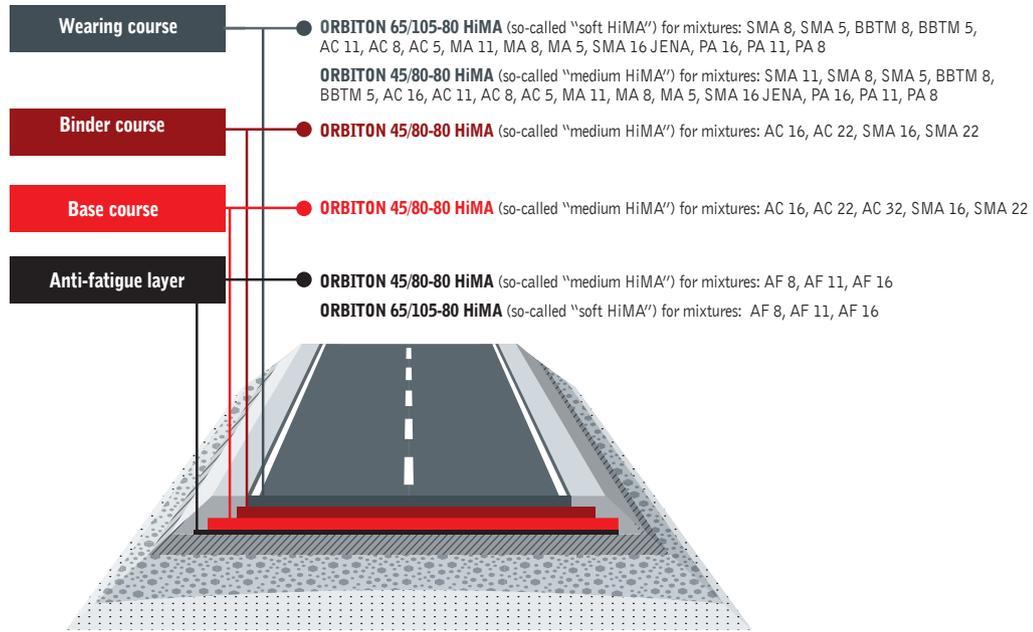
Proposed application of ORBITON HiMA binders for a modern perpetual-type flexible pavement structure [own elaboration]
